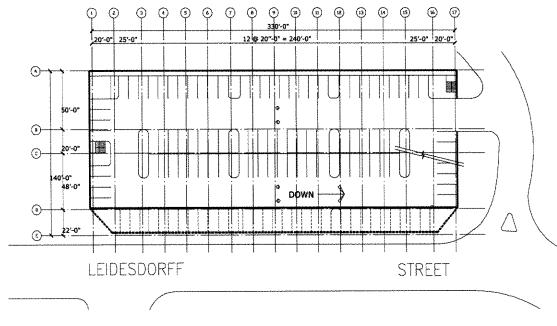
Lake Natoma Inn Parking Structure Site Plan
